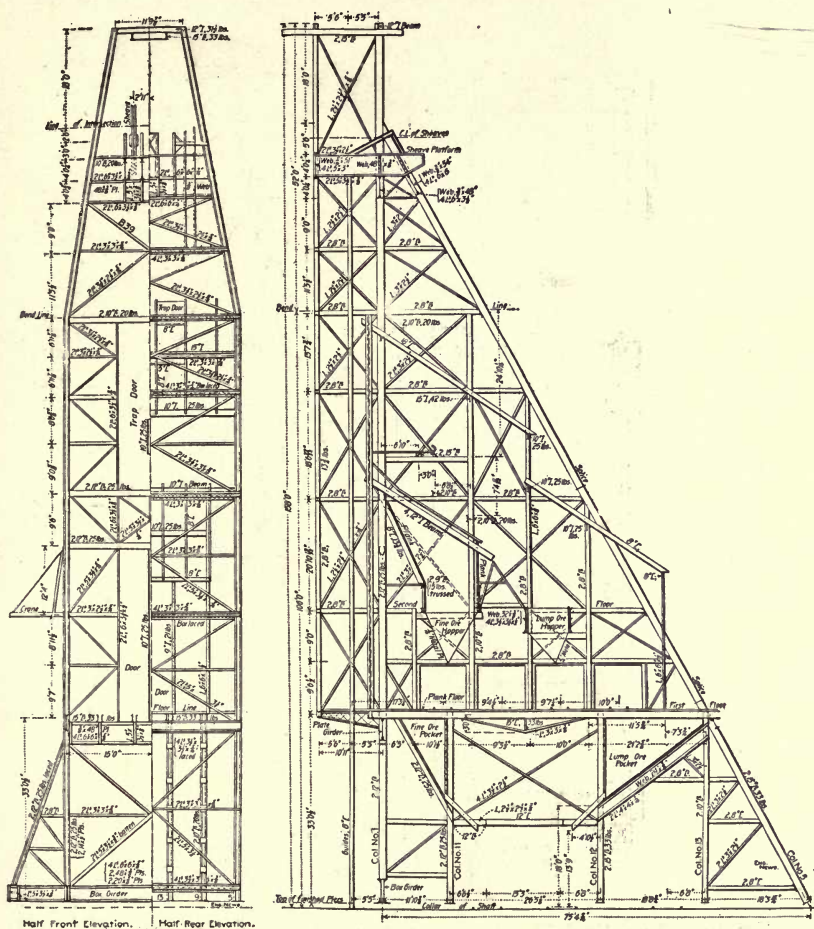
Steel Shaft-house: Oliver Iron Mining Co., Ely, Minn.
